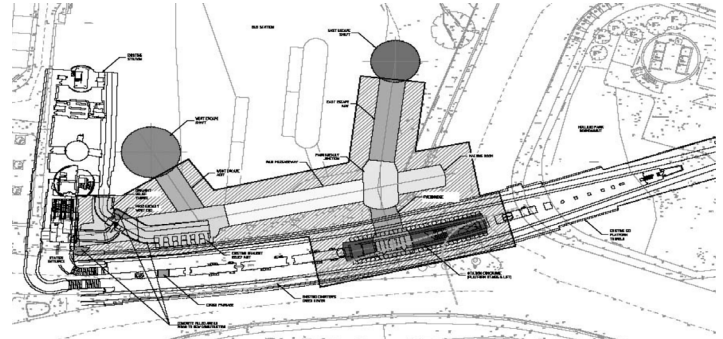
Existing Underground Station and preliminary layout of new tunnels and shafts for London Underground's MIP. (Courtesy of Morgan Est.)
